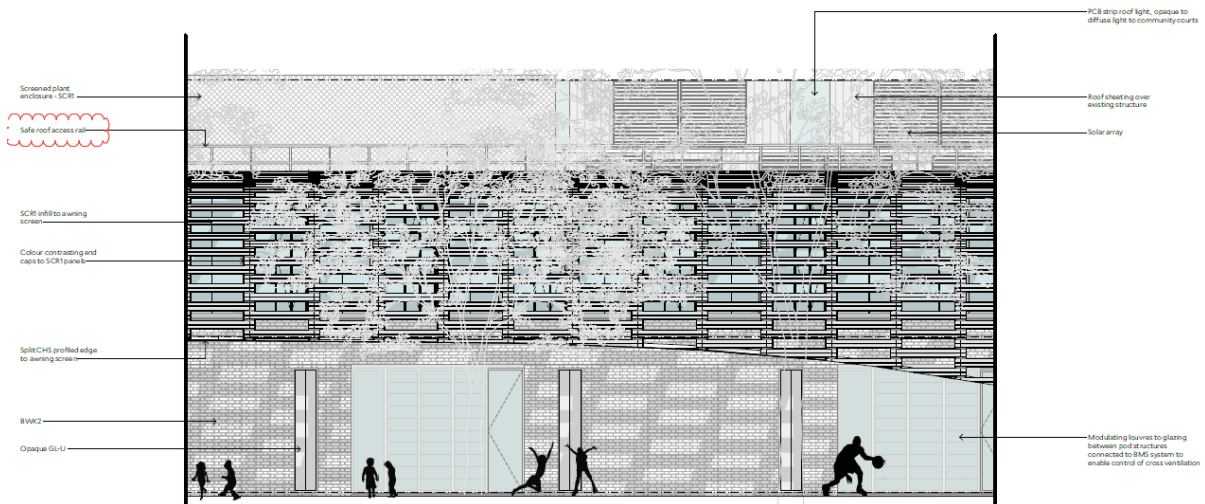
Proposed detailed north elevation, between gridlines 5 and 8
